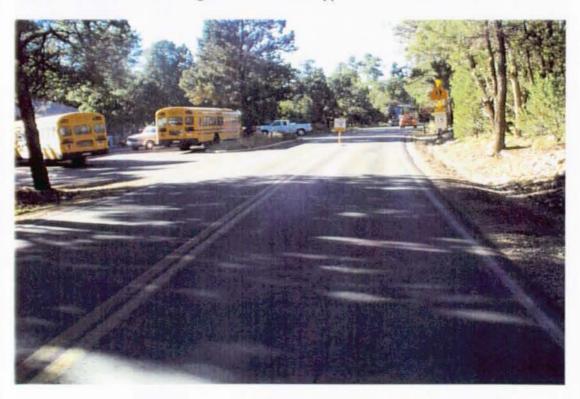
MP 1.40 - Intersection Left (935), Typical Pavement Section.
